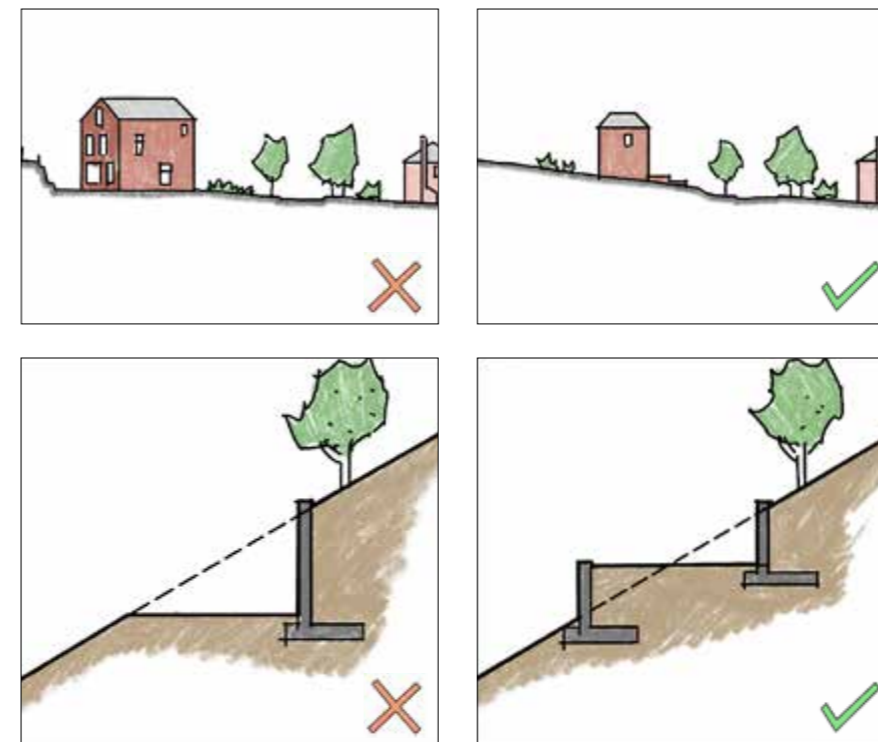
Illustration of how the scale, height and massing of development can affect the changes to the landform and need for banking or retaining walls
